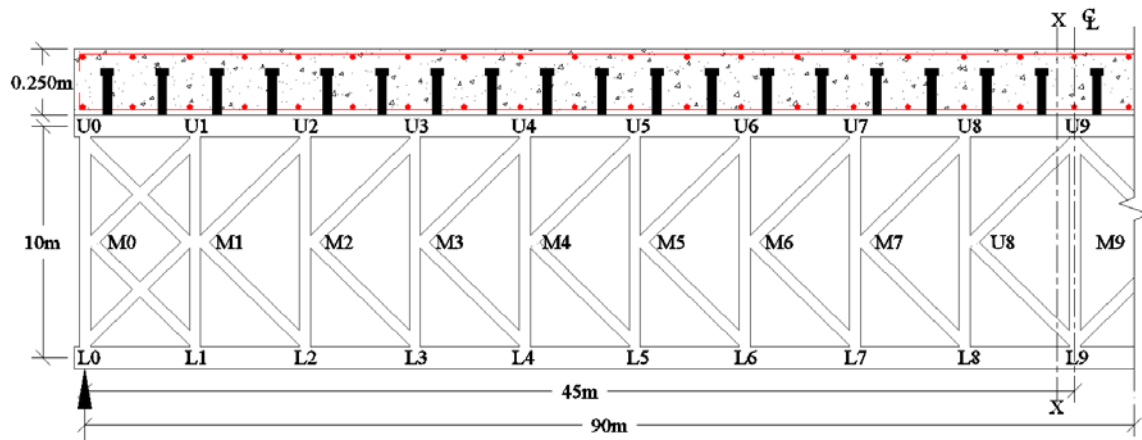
90m span composite truss bridge for 1.5x(DL+LL) case
